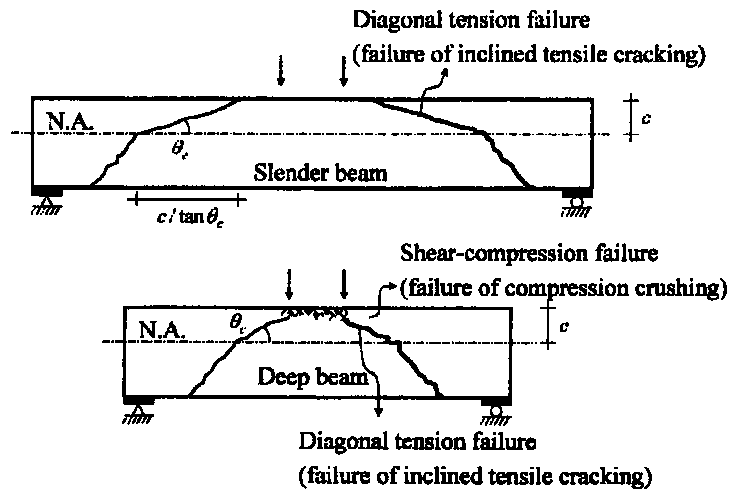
Shear failure of slender and deep beams (after Choi et al., 2007)
